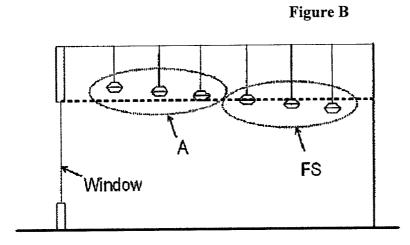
Figure B: Elevation view showing a nonresidential application of indoor lighting, labeled FS, which will be subject to this article and indoor lighting, labeled A, which is installed so that it is not subject to this article. This example presumes the structure in question is not elevated such that any of the luminaires labeled A in the figure above may be seen from any other property. If
